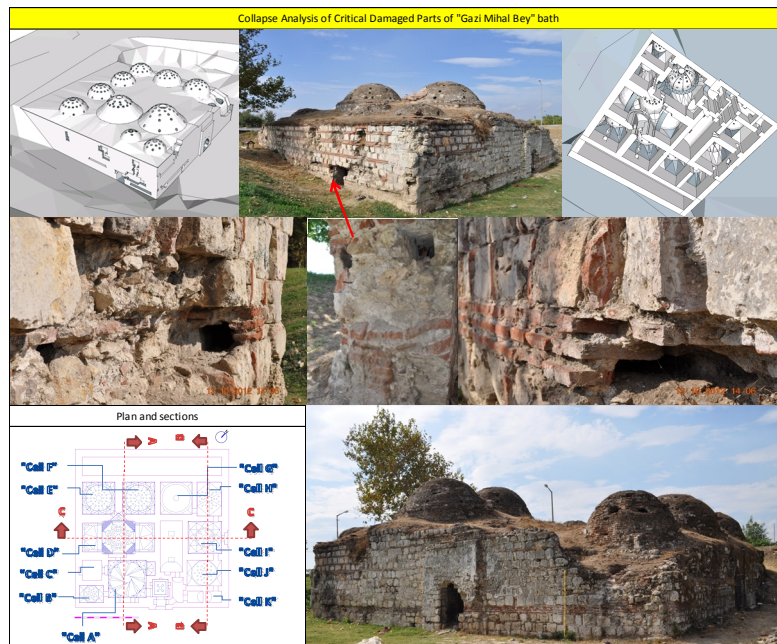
The part of the masonry wall was maintained in the previous consolidation projects. However some parts of the wall left in its original status. The part of the wall was deteriorated and inside and outside leaves was broken down. The wall is very weak for vertical and out of plane actions. In addition, empty timber tie beam sockets weaken the inside of the cell masonry leaf.
